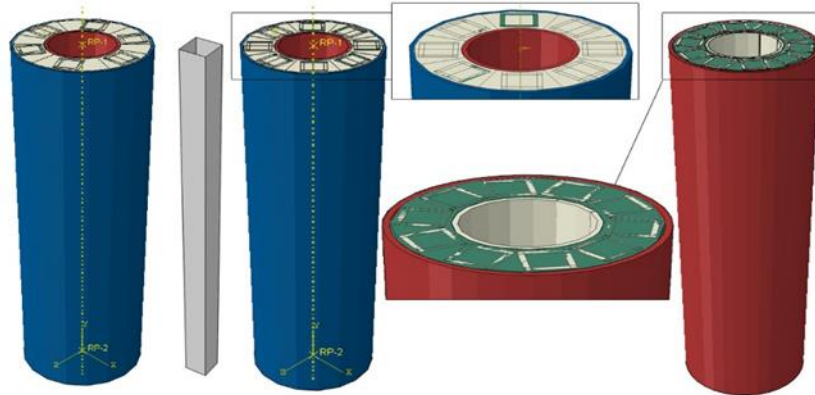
Example of a double shell steel column filled with concrete with a continuous square stiffener (examples "Box6", "Box8" and "Box10")
